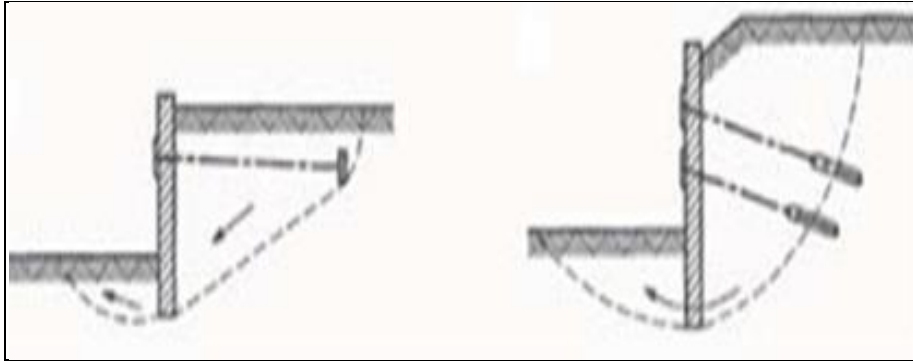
Overall instability failures due to low anchor length and short penetration depth [60, 61]
